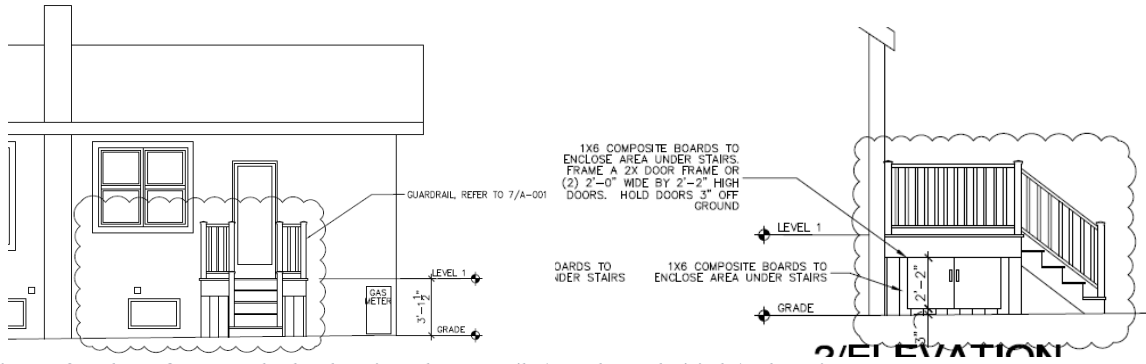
Plans for rear deck, showing the west (let) and north (right) elevations.
